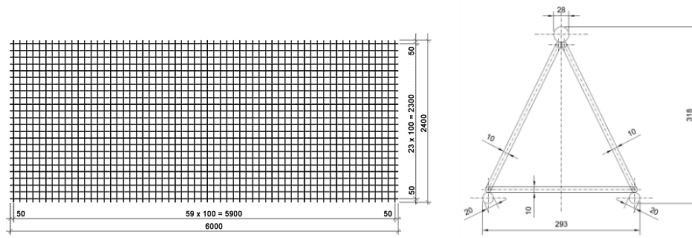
Profile DTA 80,0m – Reinforcing elements (Annahütte, Metroprojekt)
